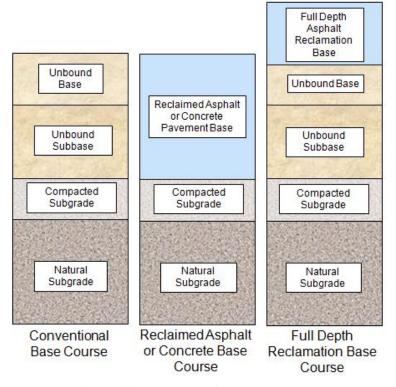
Reclaimed Asphalt and Concrete Pavement Base Layers
